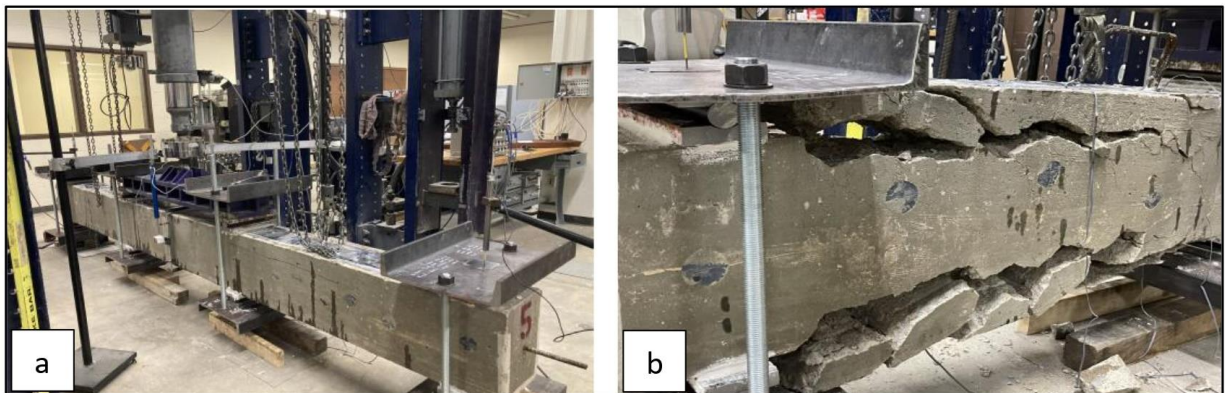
Specimen No.5. (a) before testing. (b) at failure
